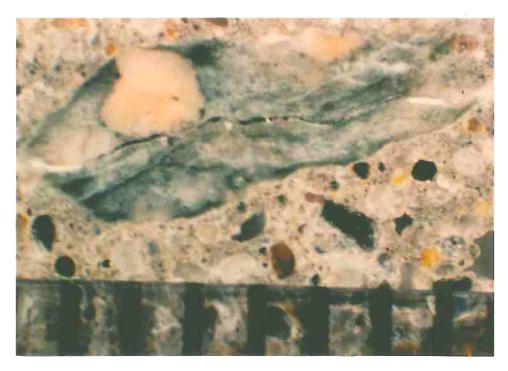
Cracking and ASR gel deposits in metarhyolite aggregate on I-295 pavement east of structure 2904.
